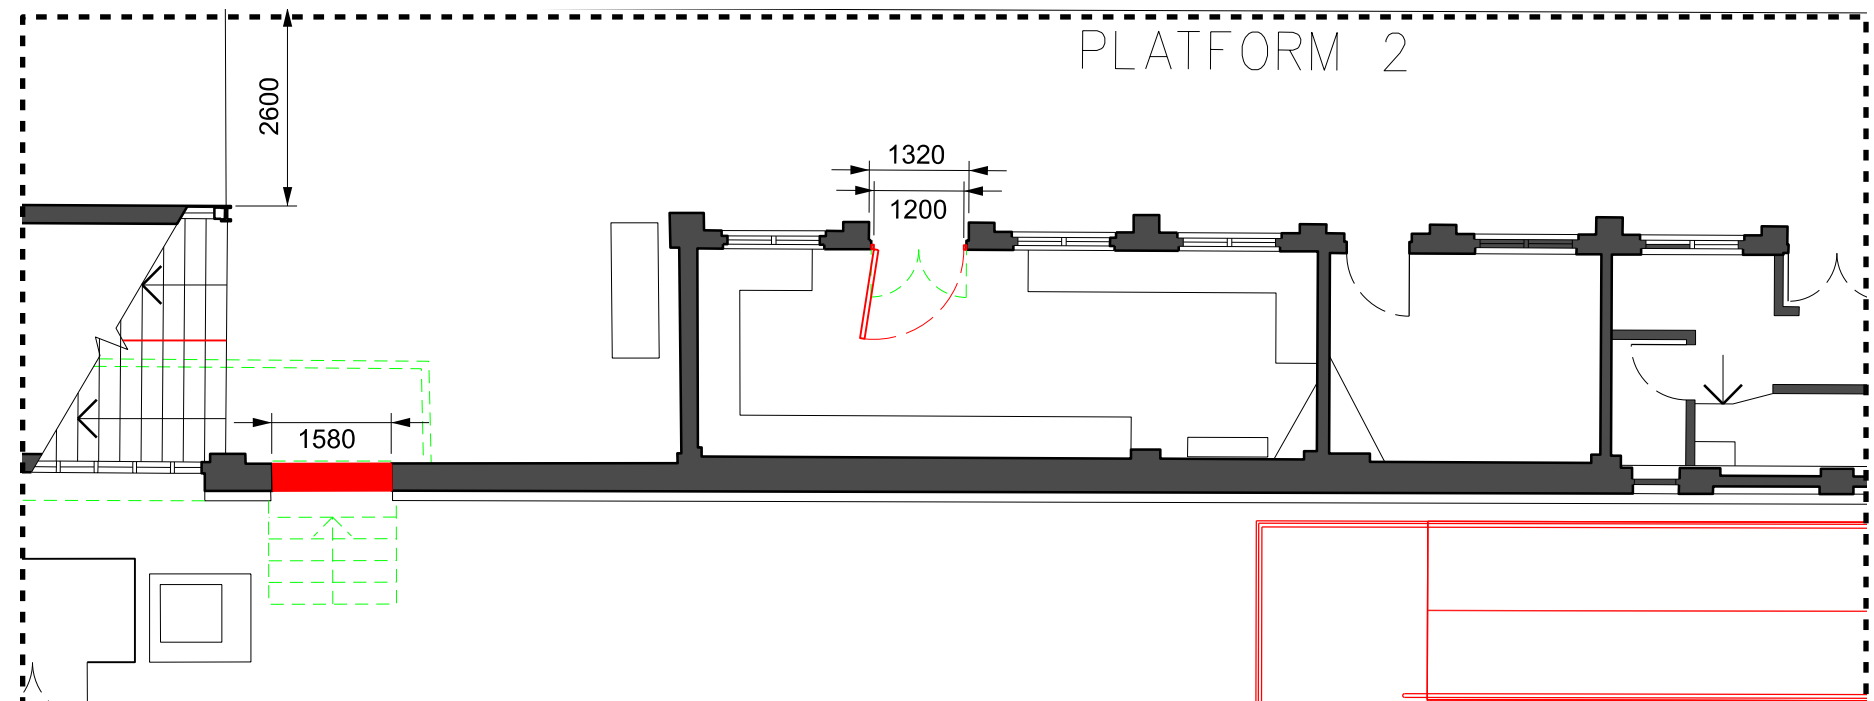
Proposed waiting room entrance from Platform 2
